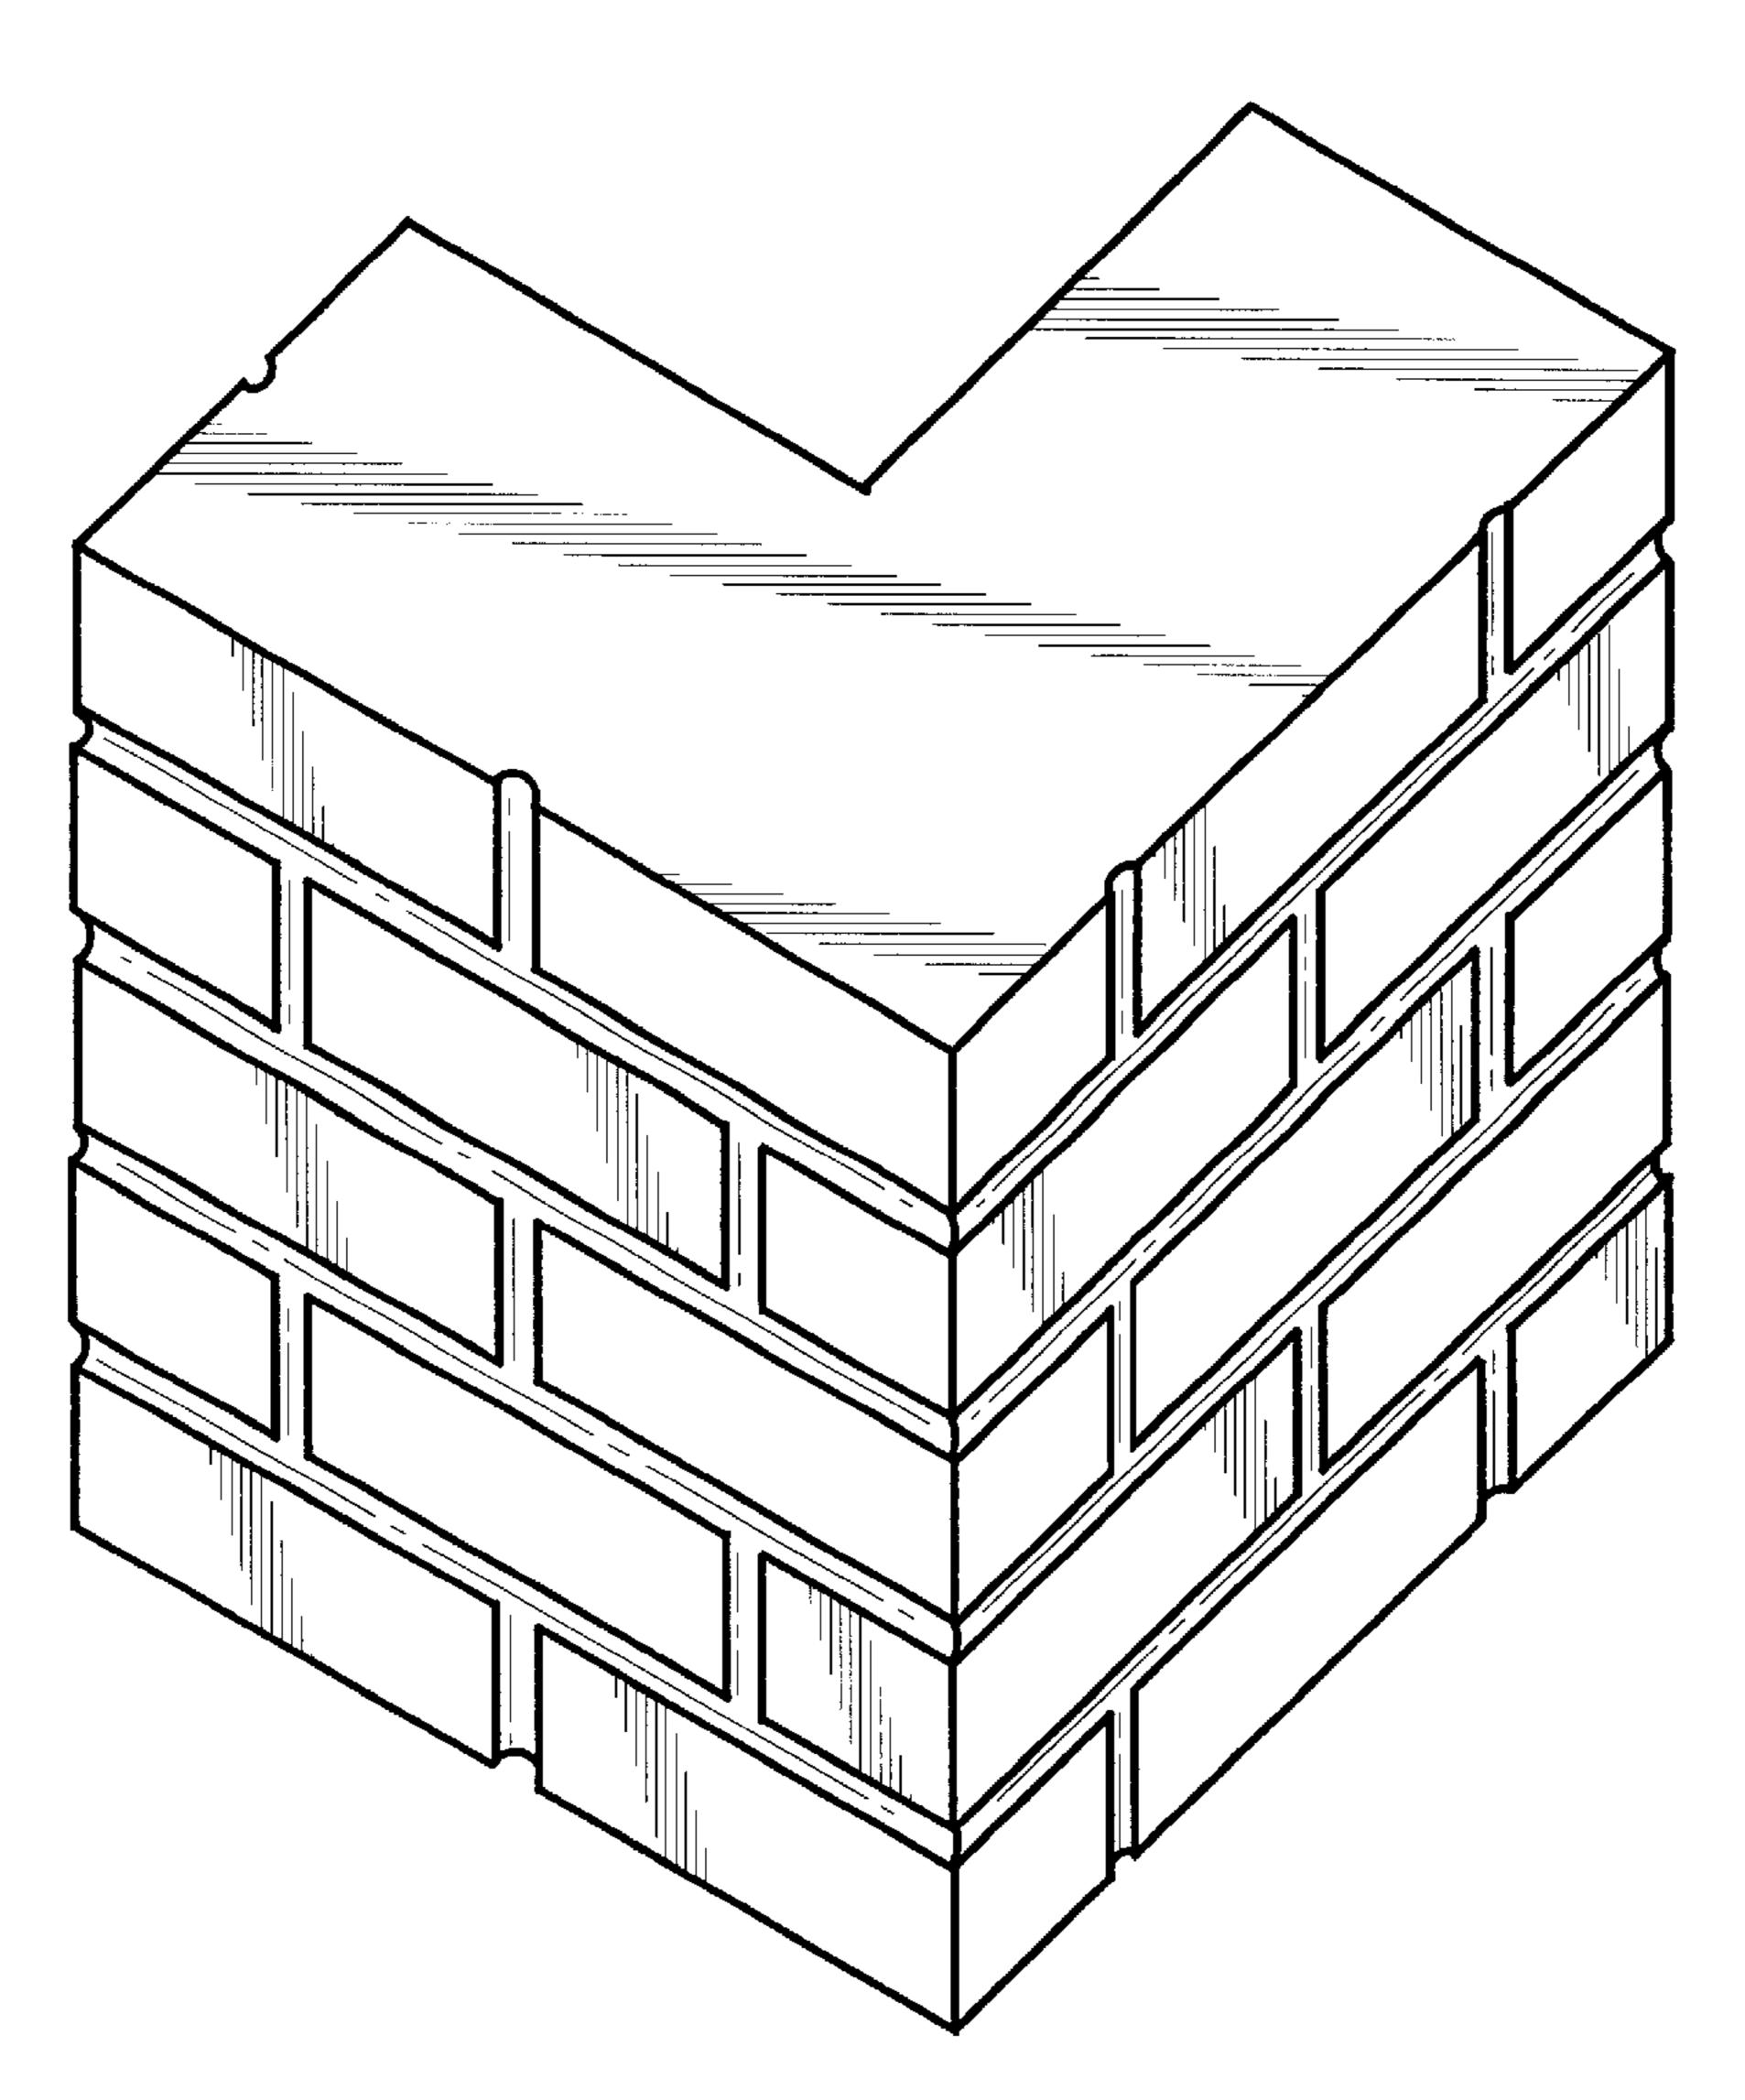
is a perspective view of the corner pillar of the concrete house pillar set.
